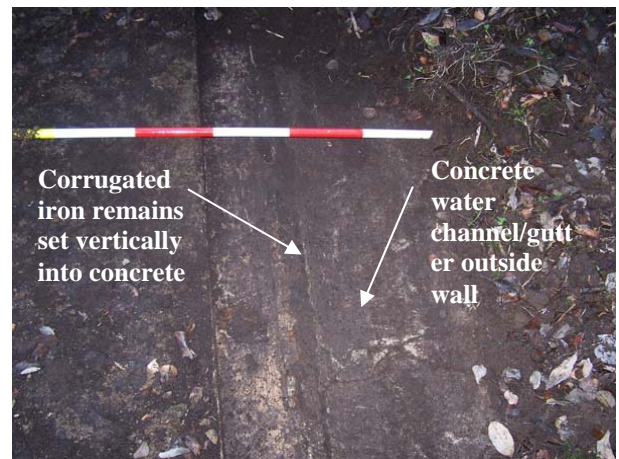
Concrete Foundation W-18 – Eastern-edge Shaping (Peet 2011)
